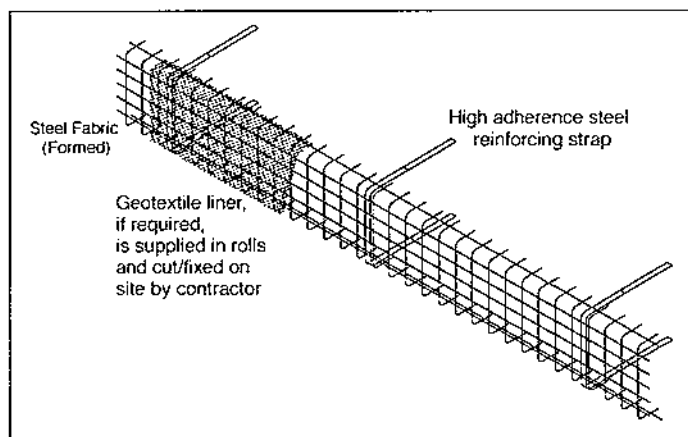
Modular facing detail. Taken from TERRATREL™ details. (Reproduced by permission of Reinforced Earth Company.)
